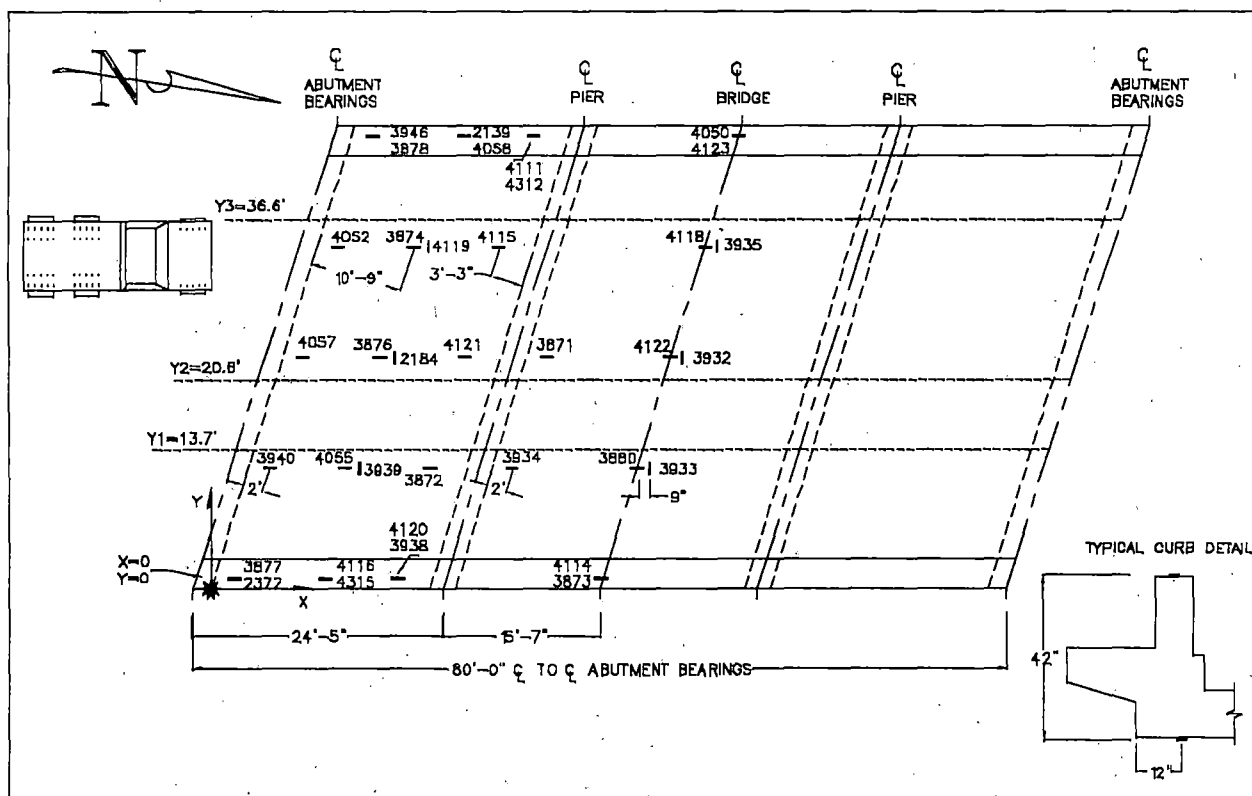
I-29 over Robinson Ditch - Instrumentation Plan.
